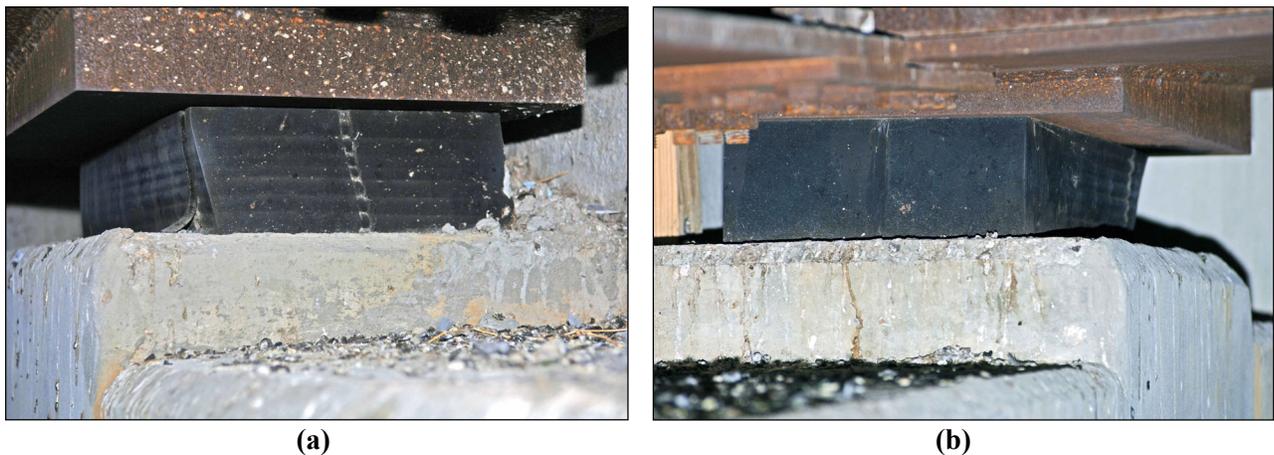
Elastomeric Bearing Supporting a Steel Straddle Bent Supporting Four Steel Tub Girders, IH 35 / US 71 / US 290 Interchange in South Austin, Texas; During Construction (April 27, 2002).
